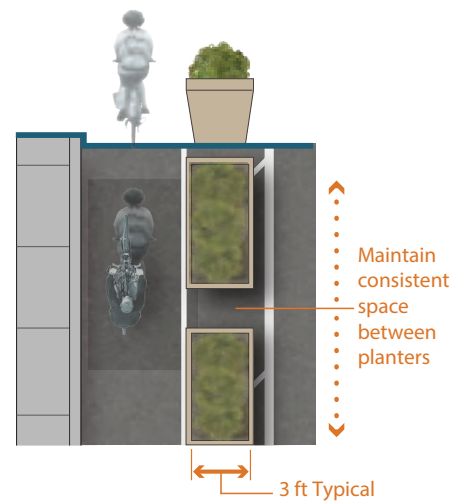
Forms of separation as outlined in the FHWA's Separated Bike Lane Planning and Design Guide.
